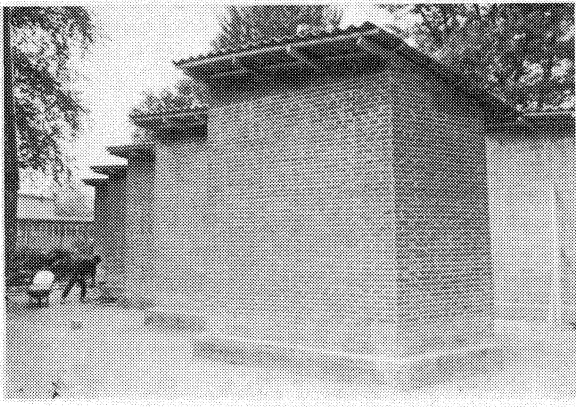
Full-scale models built in an outdoor laboratory in Milan.
